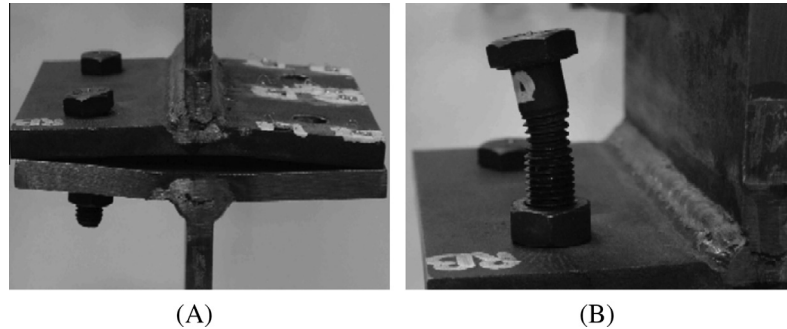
Deformed shape of a T-stub at failure (A) and detail of an unbroken bolt after failure of T-stub (B) [8].
